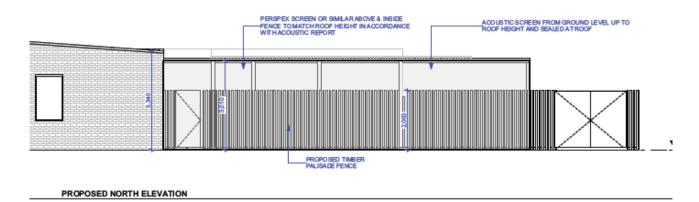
Fence on Meredith Street, screening and additional roof over rear courtyard.
